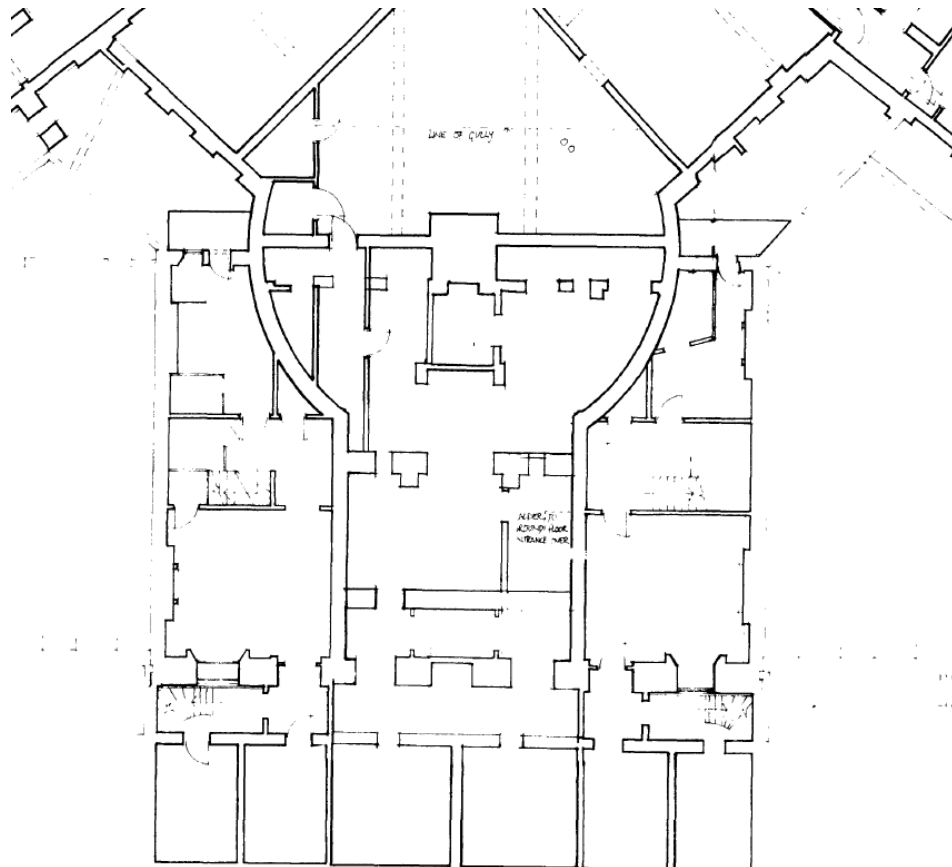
Existing basement of nos. 17-19, 1994. Camden planning ref: HB/9370268.
